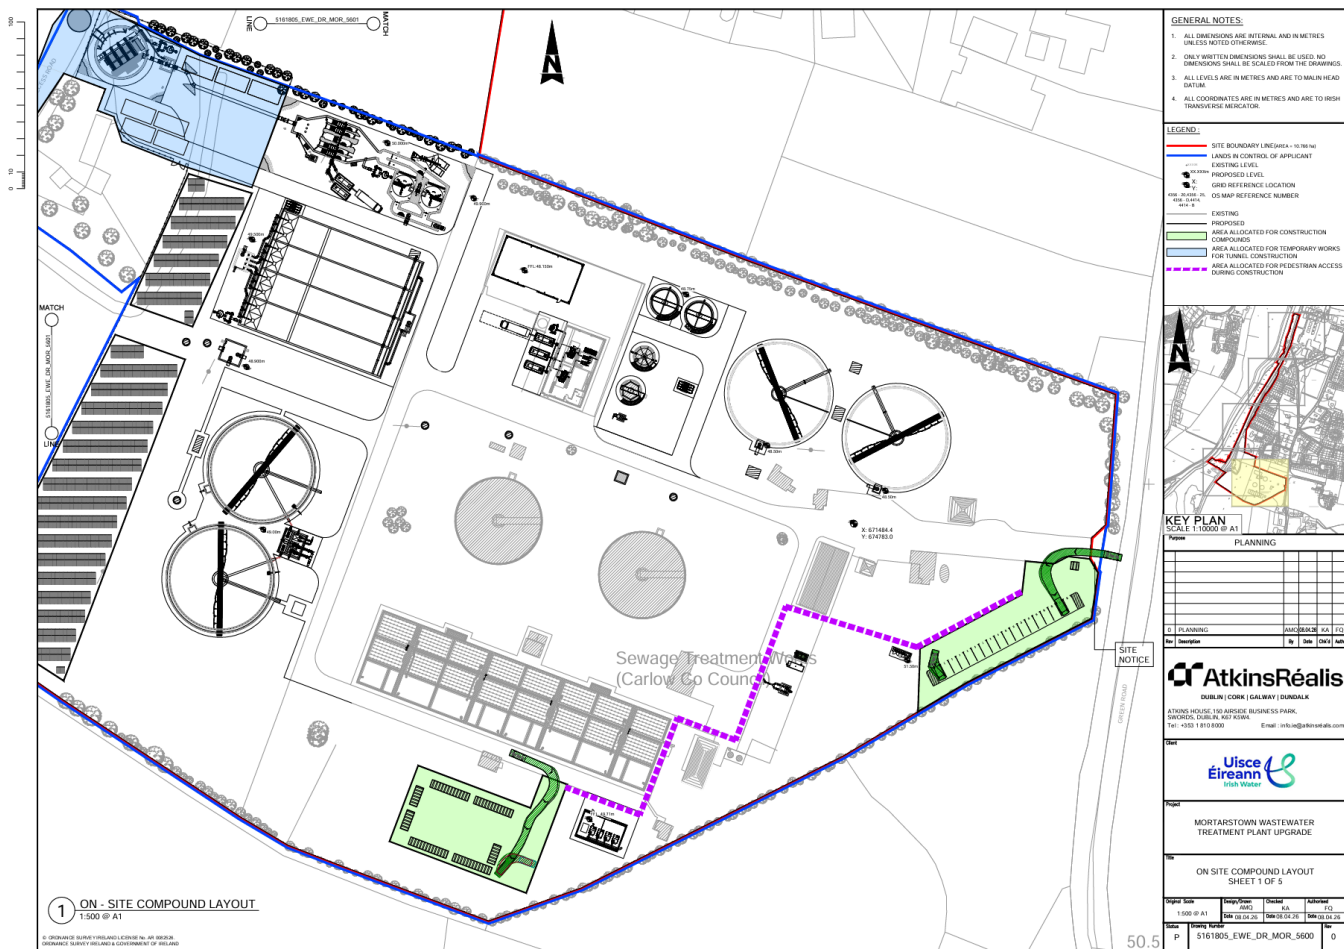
Preliminary Construction Site Compounds (1 of 2).
